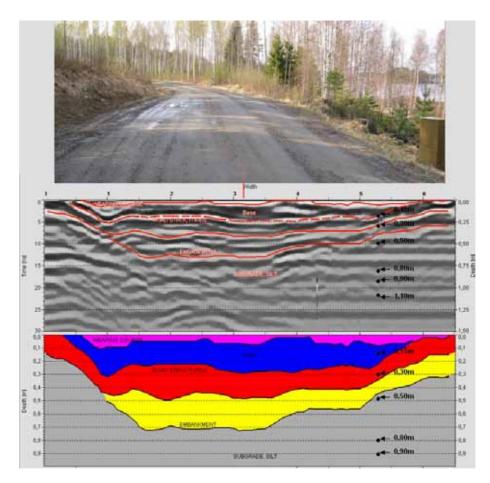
Kuorevesi test site, GPR cross section profile and its interpretation showing the road structure and location of the Percostation probes. The road width at the test site is 6.6 m Trucks with full loads are mainly using the left side of the road.
